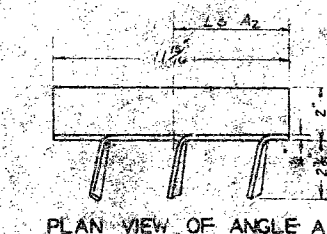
DETAILS OF PREM. ASPHALT THROUGH LIP CURB
